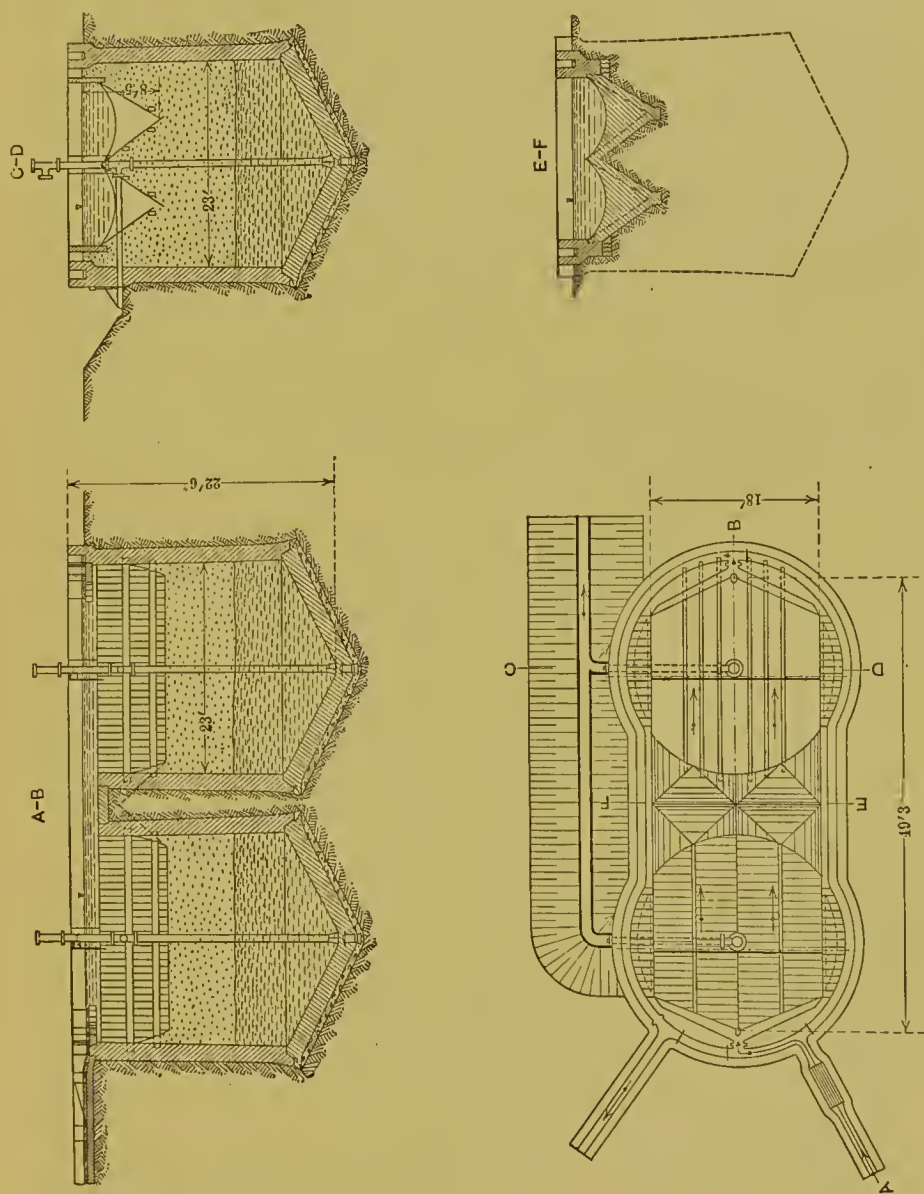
Plan and Section of the Essen Tank (Imhoff, 1909).
